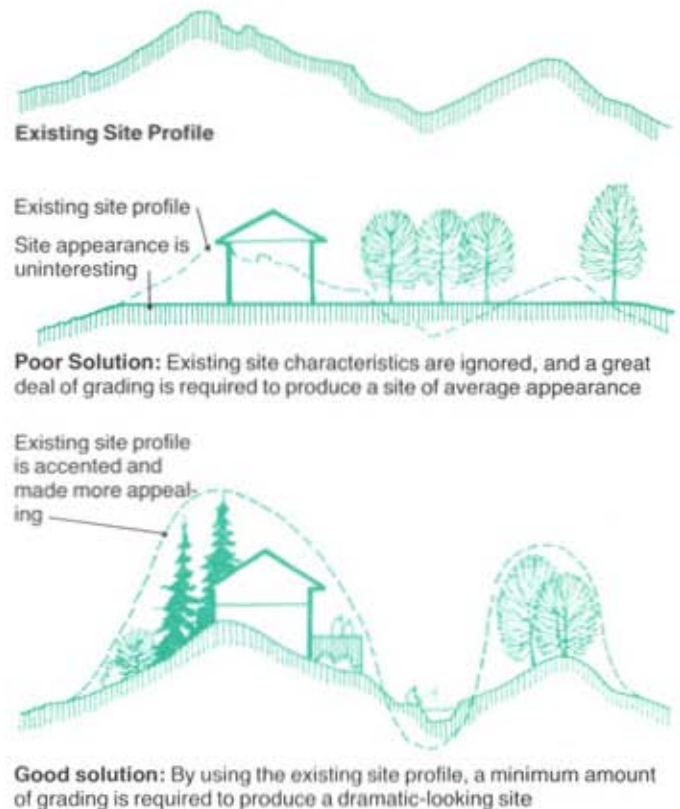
Grading changes can be minimized by matching the existing site profile to the proposed development concept.
